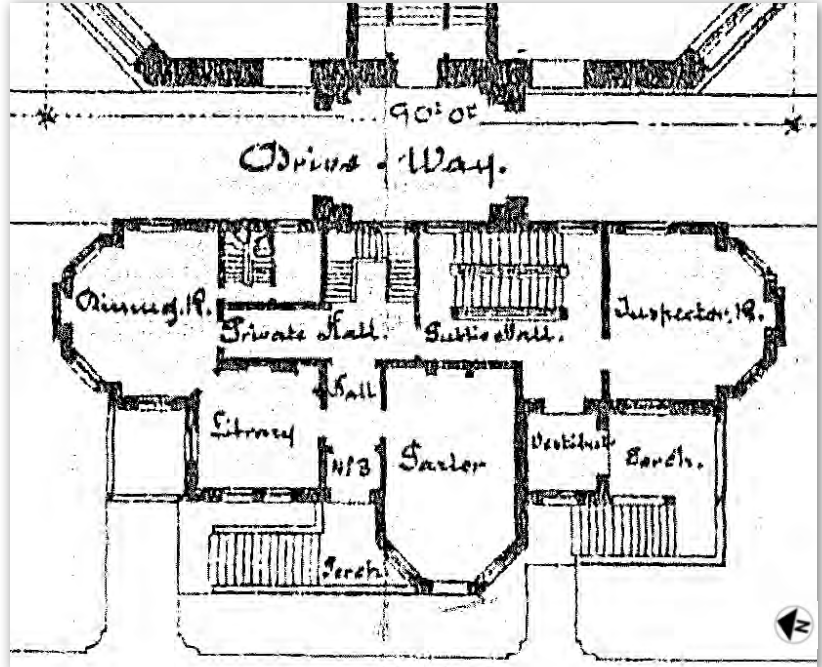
Proposed first floor plan of the Warden's Residence by E. M. Butz from 1883, showing the driveway/port cochere that separated the Front House from the Main Penitentiary Building as well as the original entrance stairs at the front. This iteration suggests that the Inspector's Room would have been on the first floor. However, the 1908 audit indicates that a reception room replaced this function by that time.
